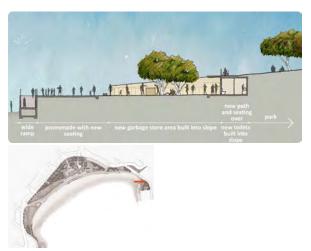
(above) Concept section through Biddigal Park showing new toilets and garbage store area recessed into the slope. Location of section (below). Source: Waverley Council
